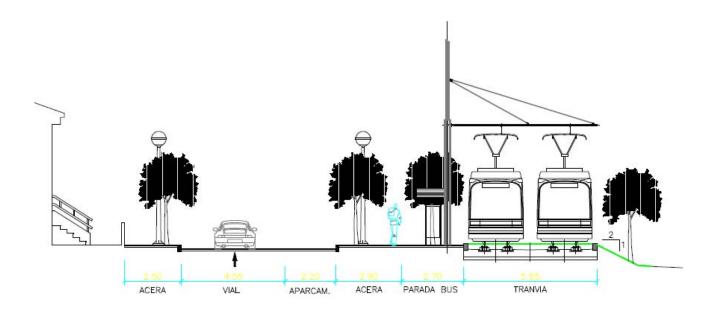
, CROSS SECTION WITH COMBINED LIGHT RAIL TRACKS IN AN URBAN BOULEVARD, SOURCE: IDOM ZARAGOZA
